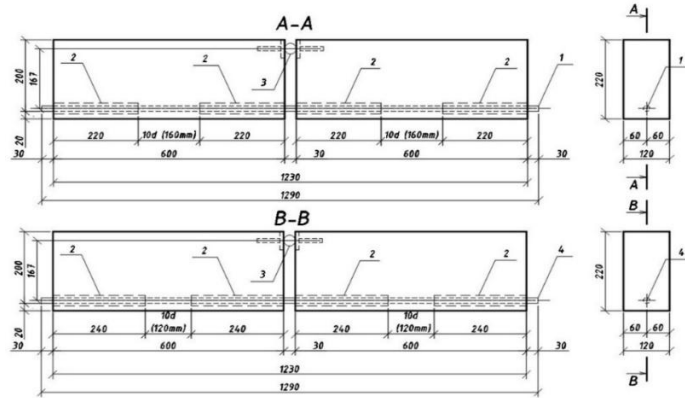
Structure of test specimens – concrete beams BSR and BFR: 1 – steel reinforcement Ø16 A500C; 2 – plastic tube; 3 – steel cylinder; 4 – fiberglass composite reinforcement Ø12 AKC800.
